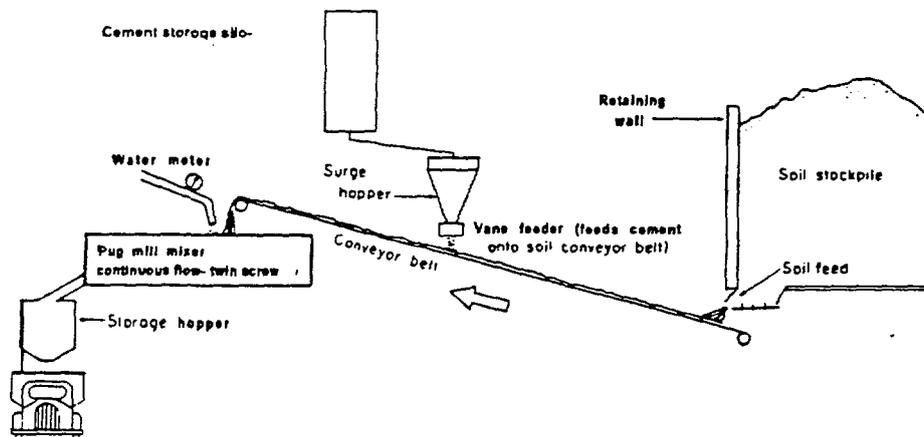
Diagram of continuous-flow central plant for mixing soil cement
